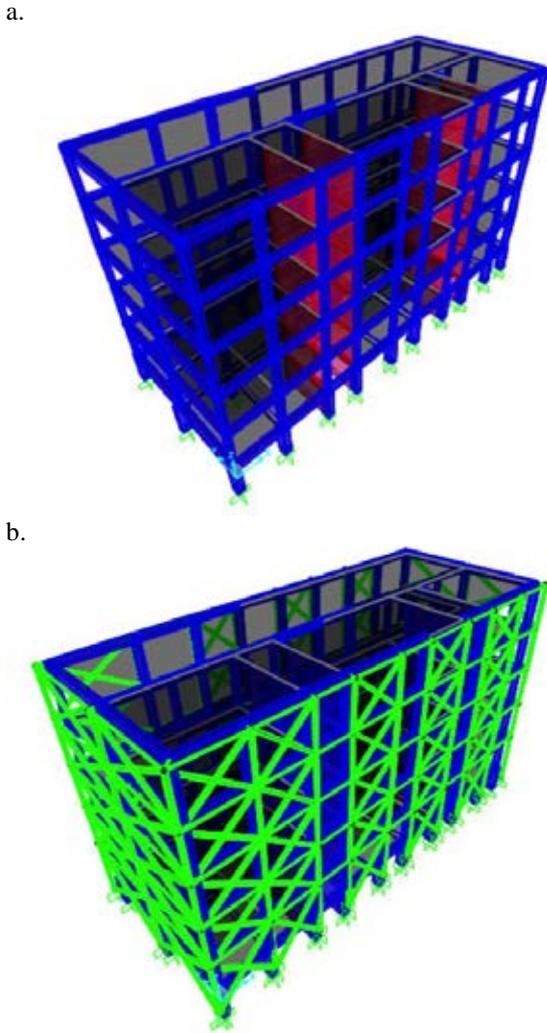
FE models of: a. bare existing structure; b. coupled system, i.e., existing structure coupled to the exoskeleton structure.
